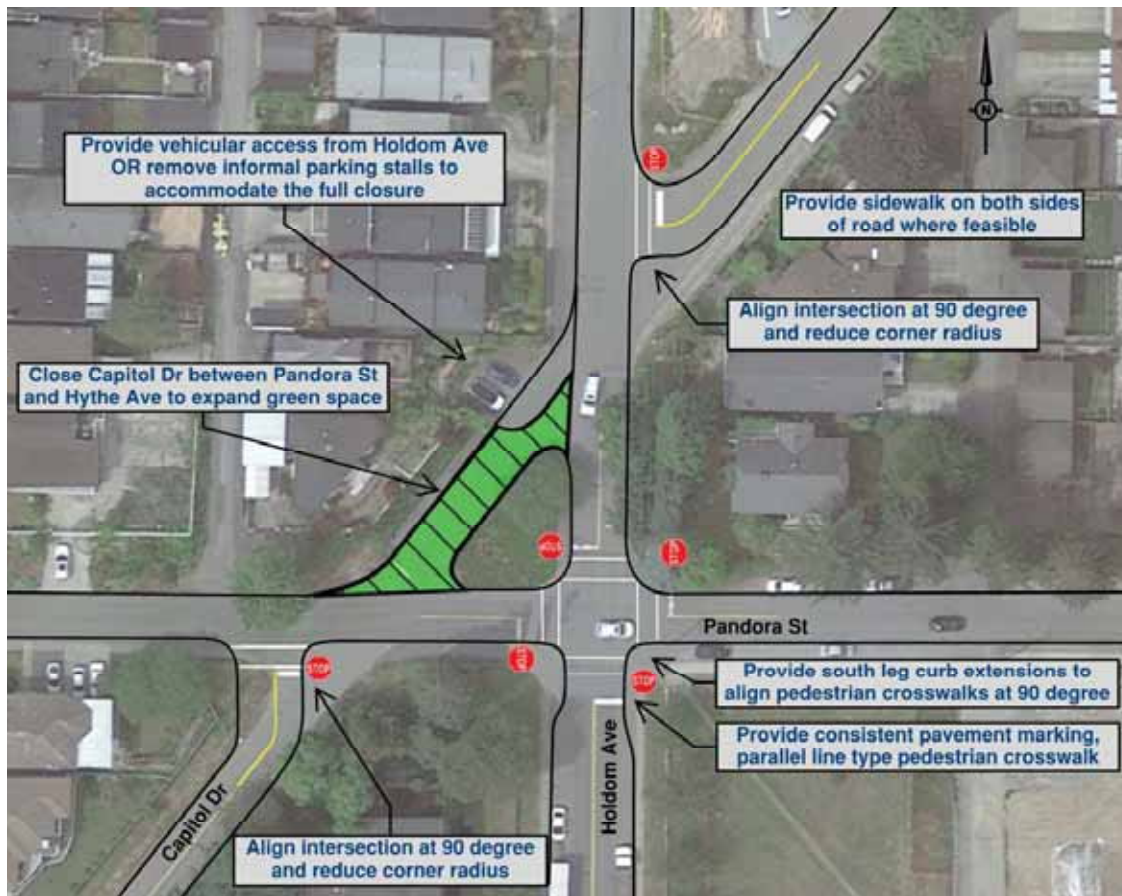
Holdom Avenue, Pandora Street and Capitol Drive Intersection Improvements
